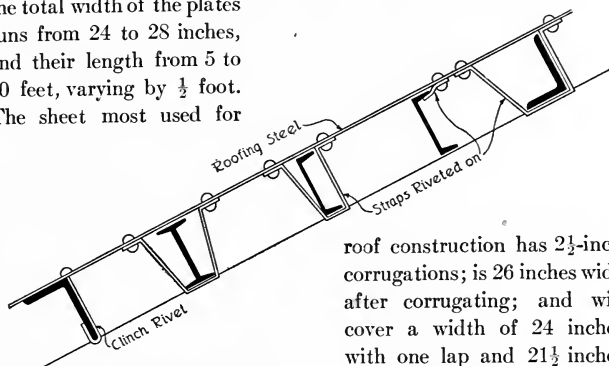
Showing How Steel Roofing is Fastened to Purlins.
